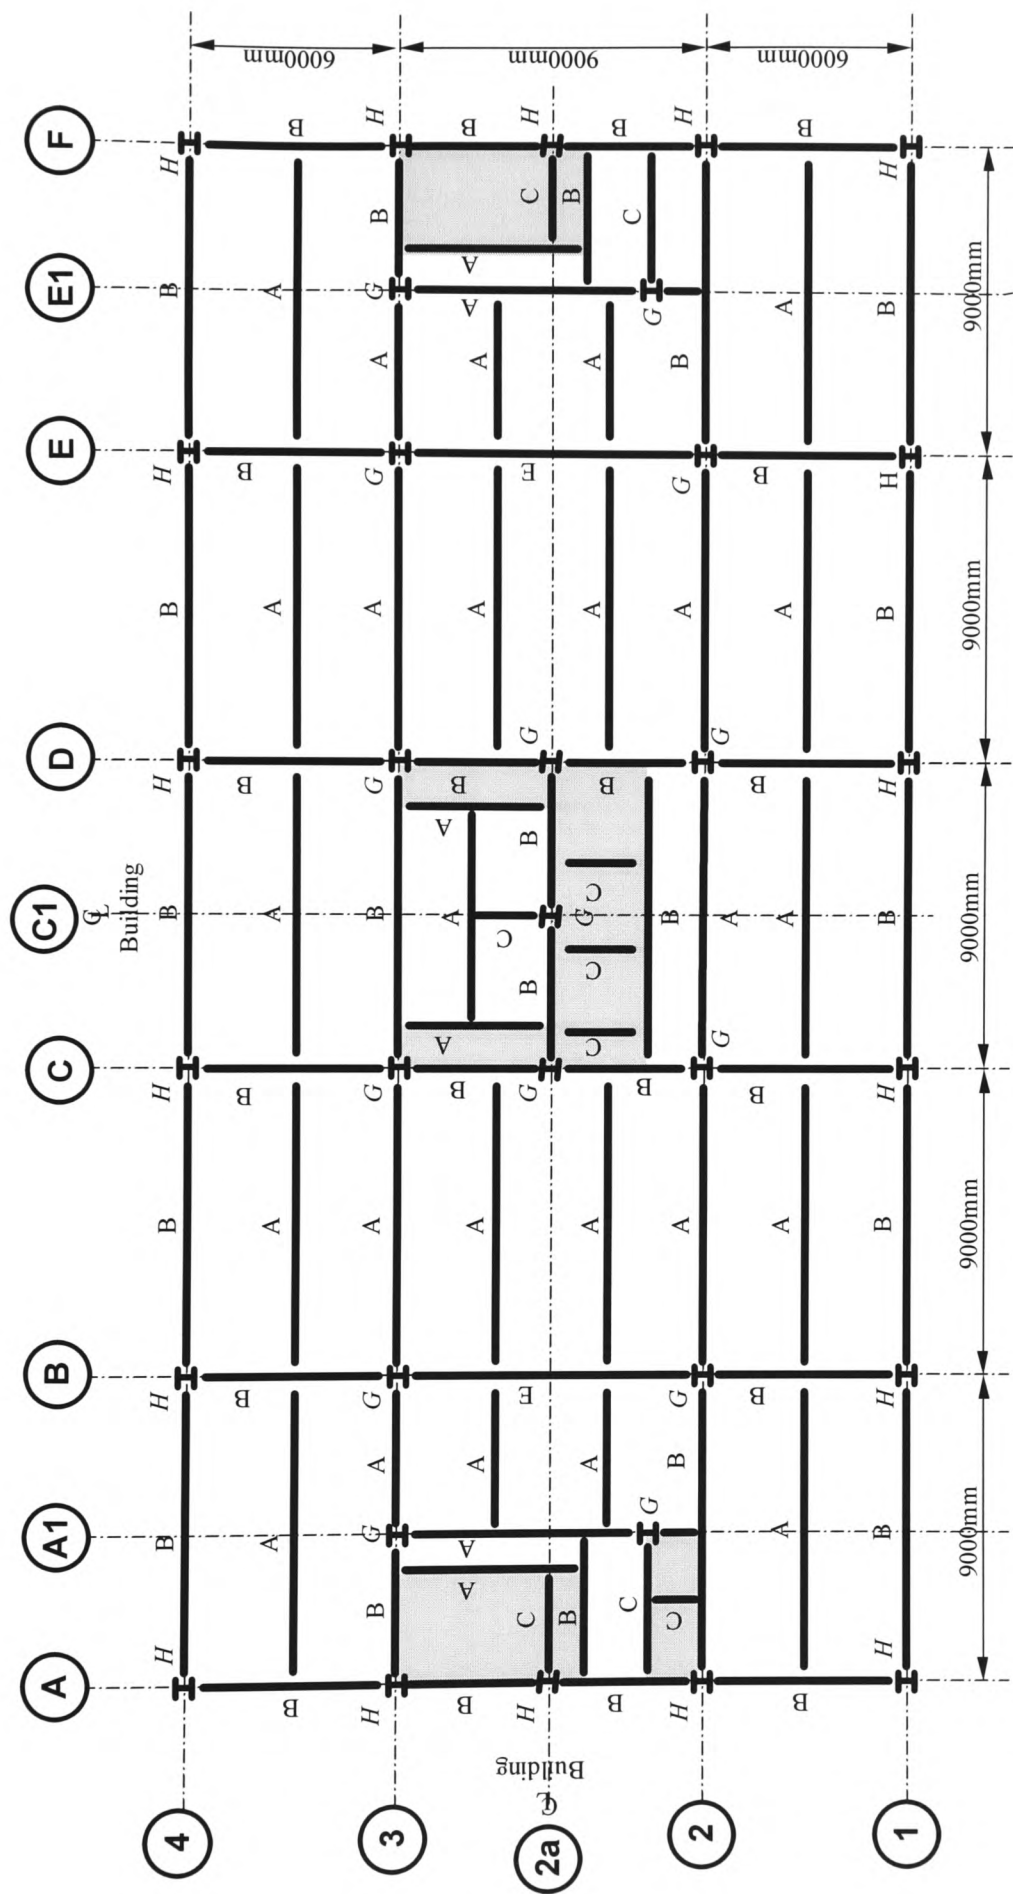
Plan on the 5th floor showing the general layout of the main structural elements
